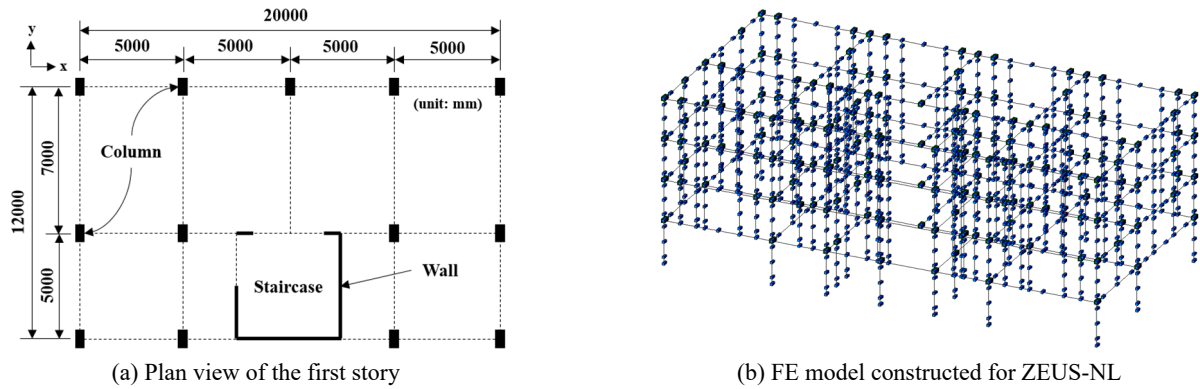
Plan view of the first story and the FE model constructed for ZEUS-NL
